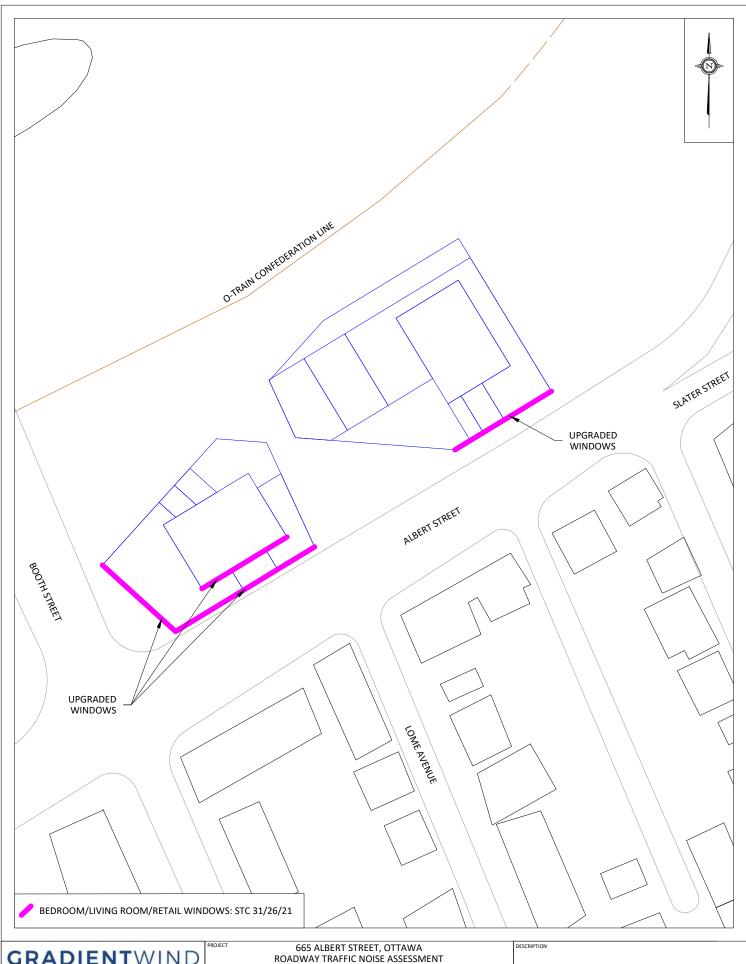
SITE PLAN AND SURROUNDING CONTEXT
